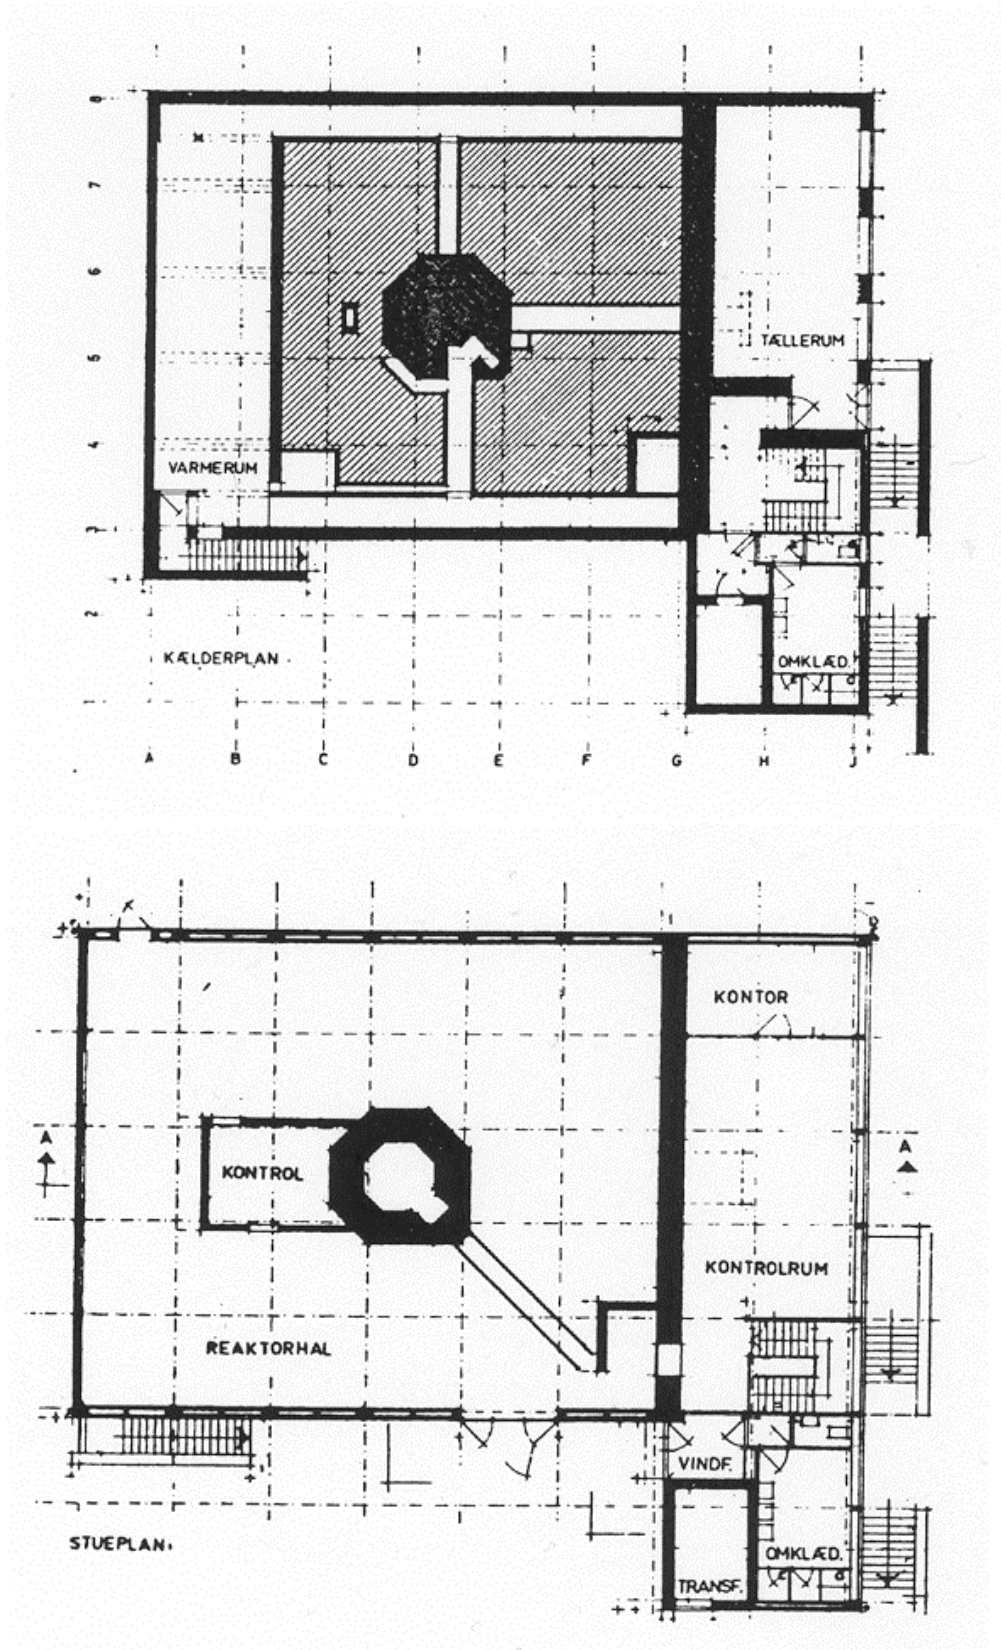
Horizontal section of the underground floor (far above drawing) and ground floor (just above drawing) of building 117.
